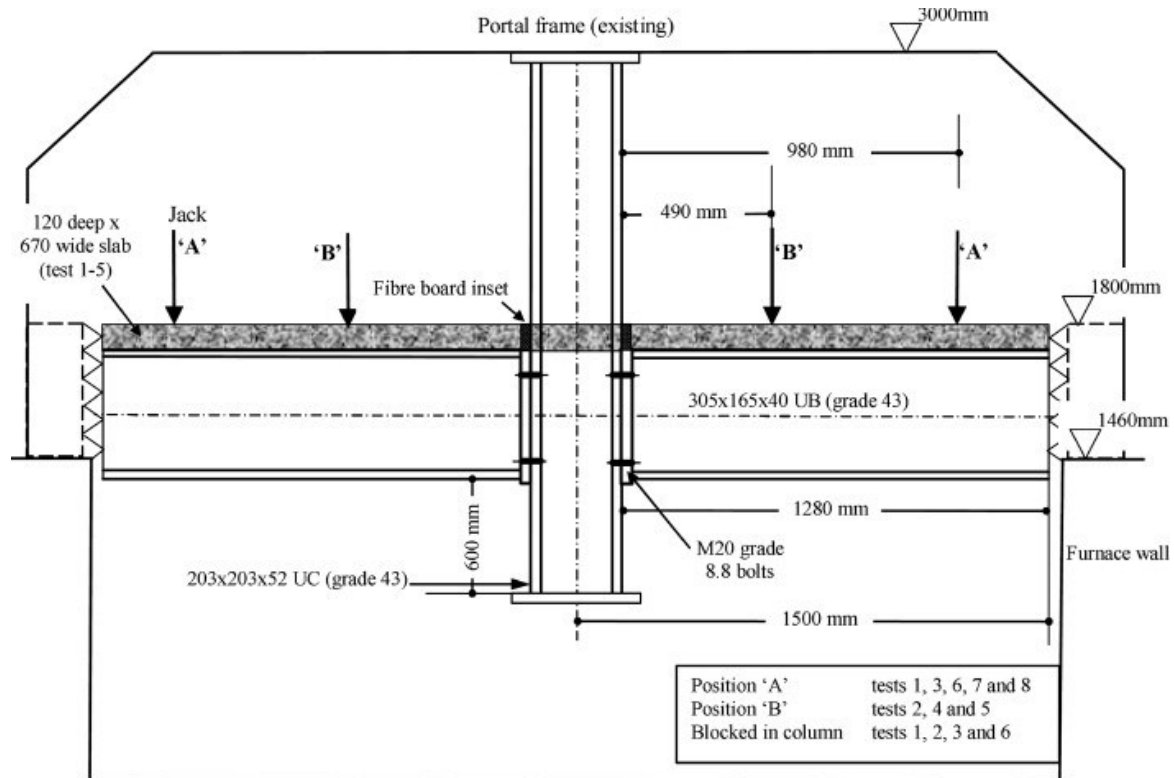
Arrangement of the fire tests on beam-to-column joints [29]
